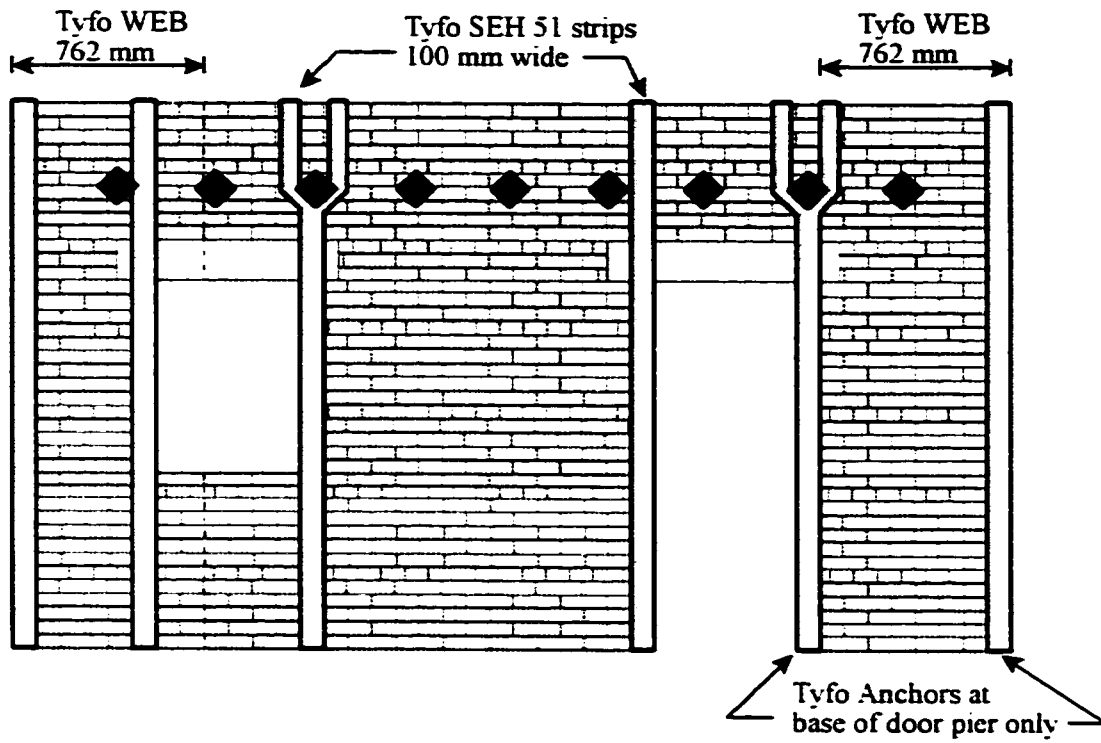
West wall elevation of URM specimen repaired with Tyfo SEH 51 and WEB. (the east wall is simply a mirror image).
